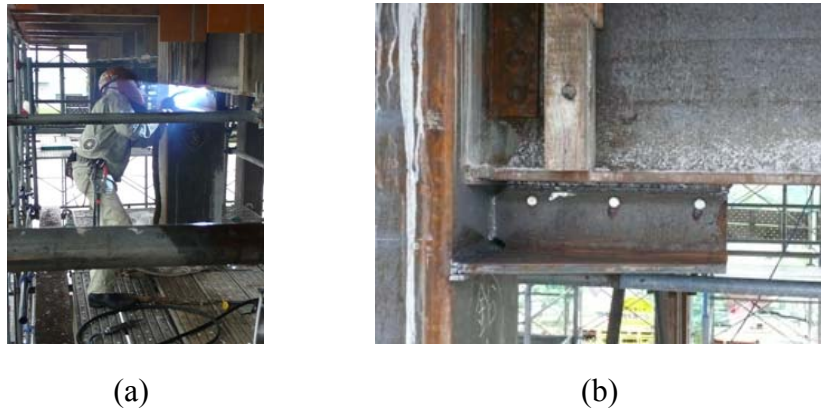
Haunch connection: (a) Welding situation; (b) Close-up view
